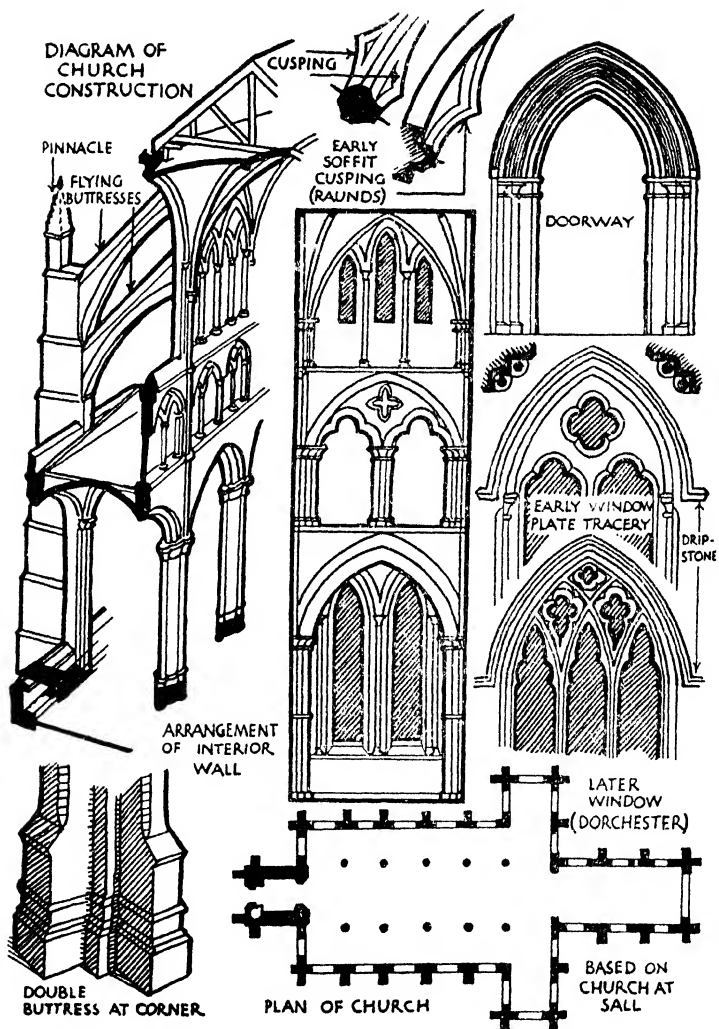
DETAILS OF EARLY ENGLISH STYLE
